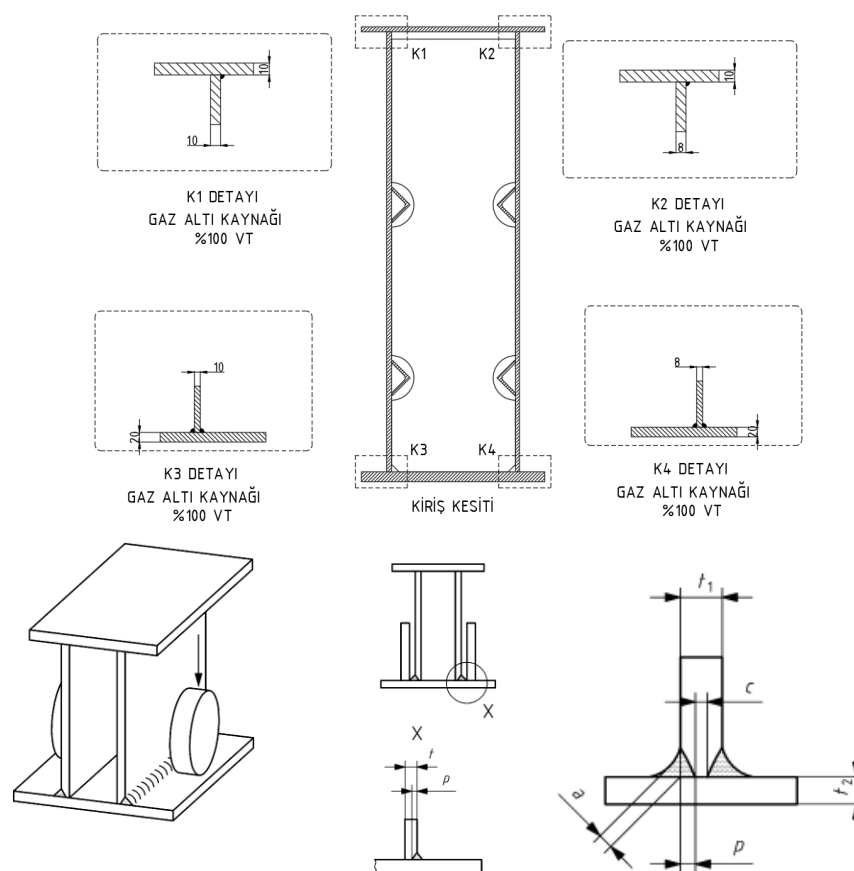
Section and Plate Welding Details of C-Type Portal Crane Beam: EN 13001-3-1+A1-Table D.3-3.16.
